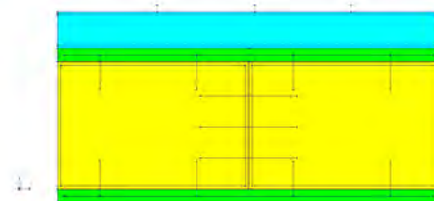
PST 3: Three vertical connection boxes and four grouted rebar at horizontal connections per LWFC panel (FE Model 05-01)
